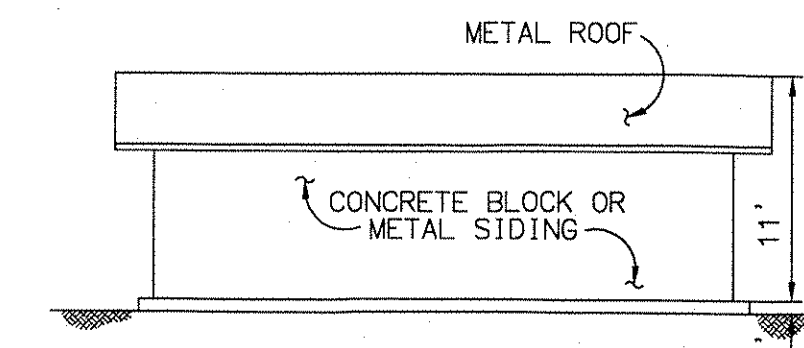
DETAILS FOR LENGTHS IN EXCESS OF 20 FEET
